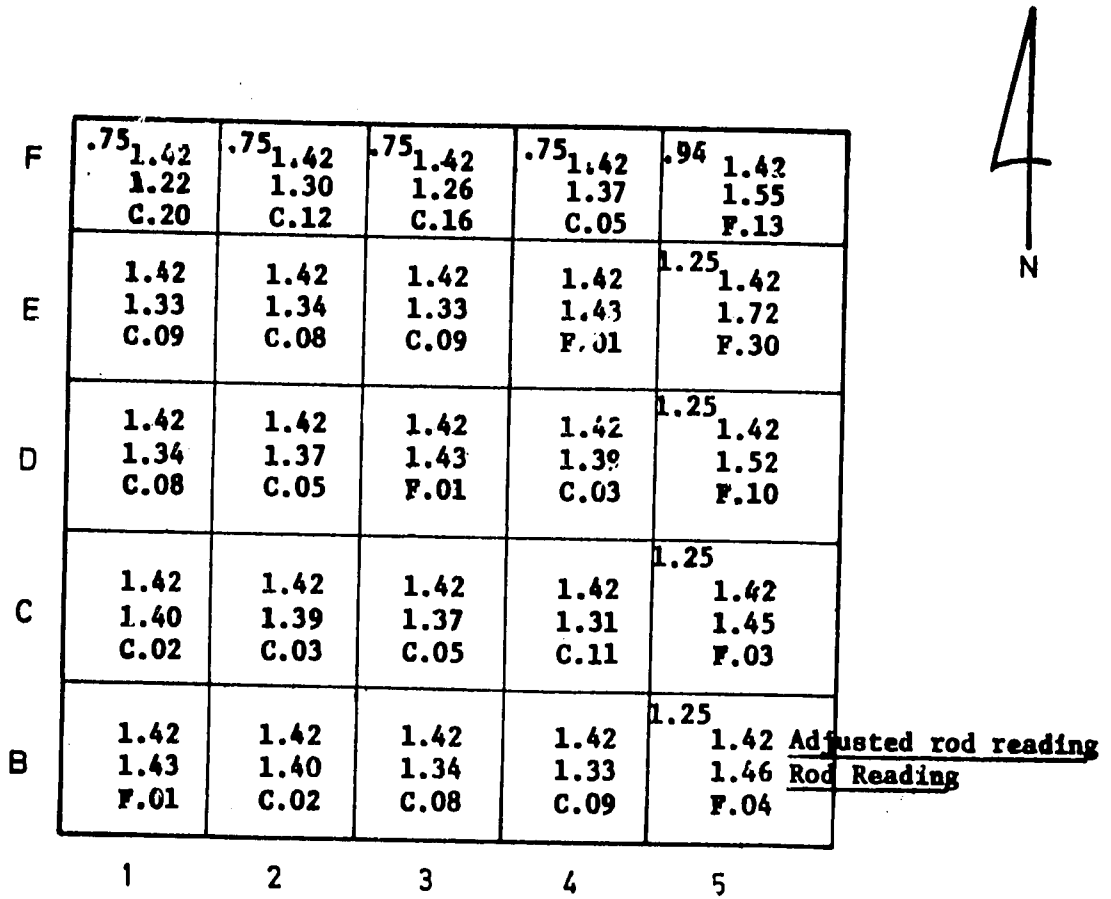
Grid Sheet Showing Rod Readings, Adjusted Average Rod Reading, Identified Odd Areas, and Fill and Cut Designations for a Level Field.
